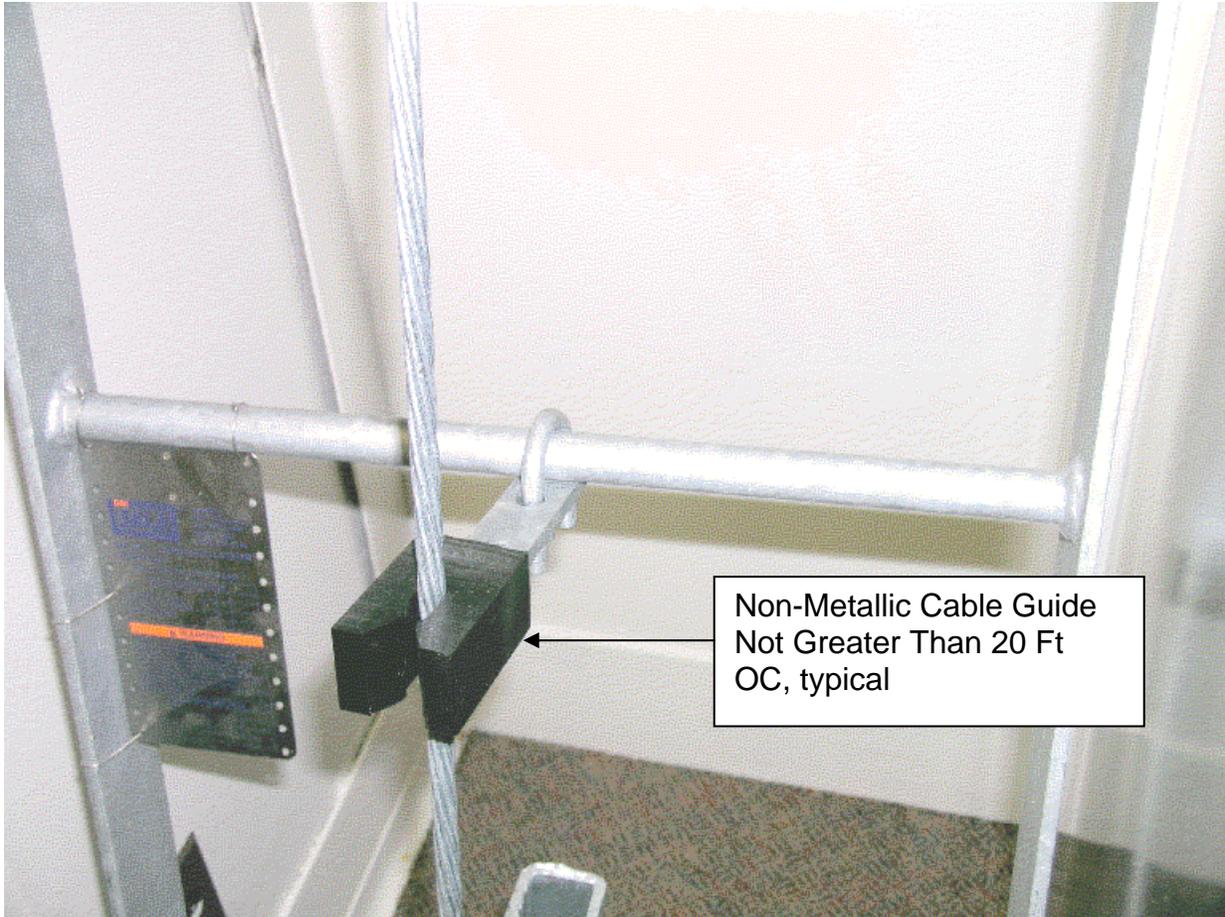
, Typical Non-Metallic Cable Guide of the LAD-SAF Flexible Cable System
